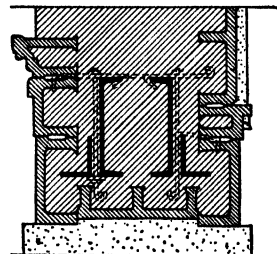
Section over entrance showing method of supporting terra cotta.
